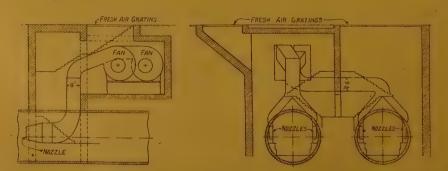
Longitudinal and cross sections, showing ventilation arrangements of the Battery Park tunnels.
